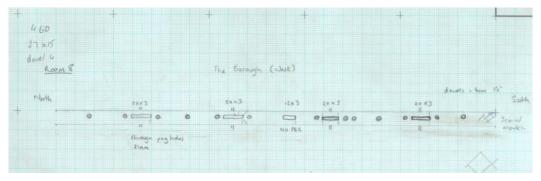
Measured sketch of the re-used beam in the ceiling of Room 8.
